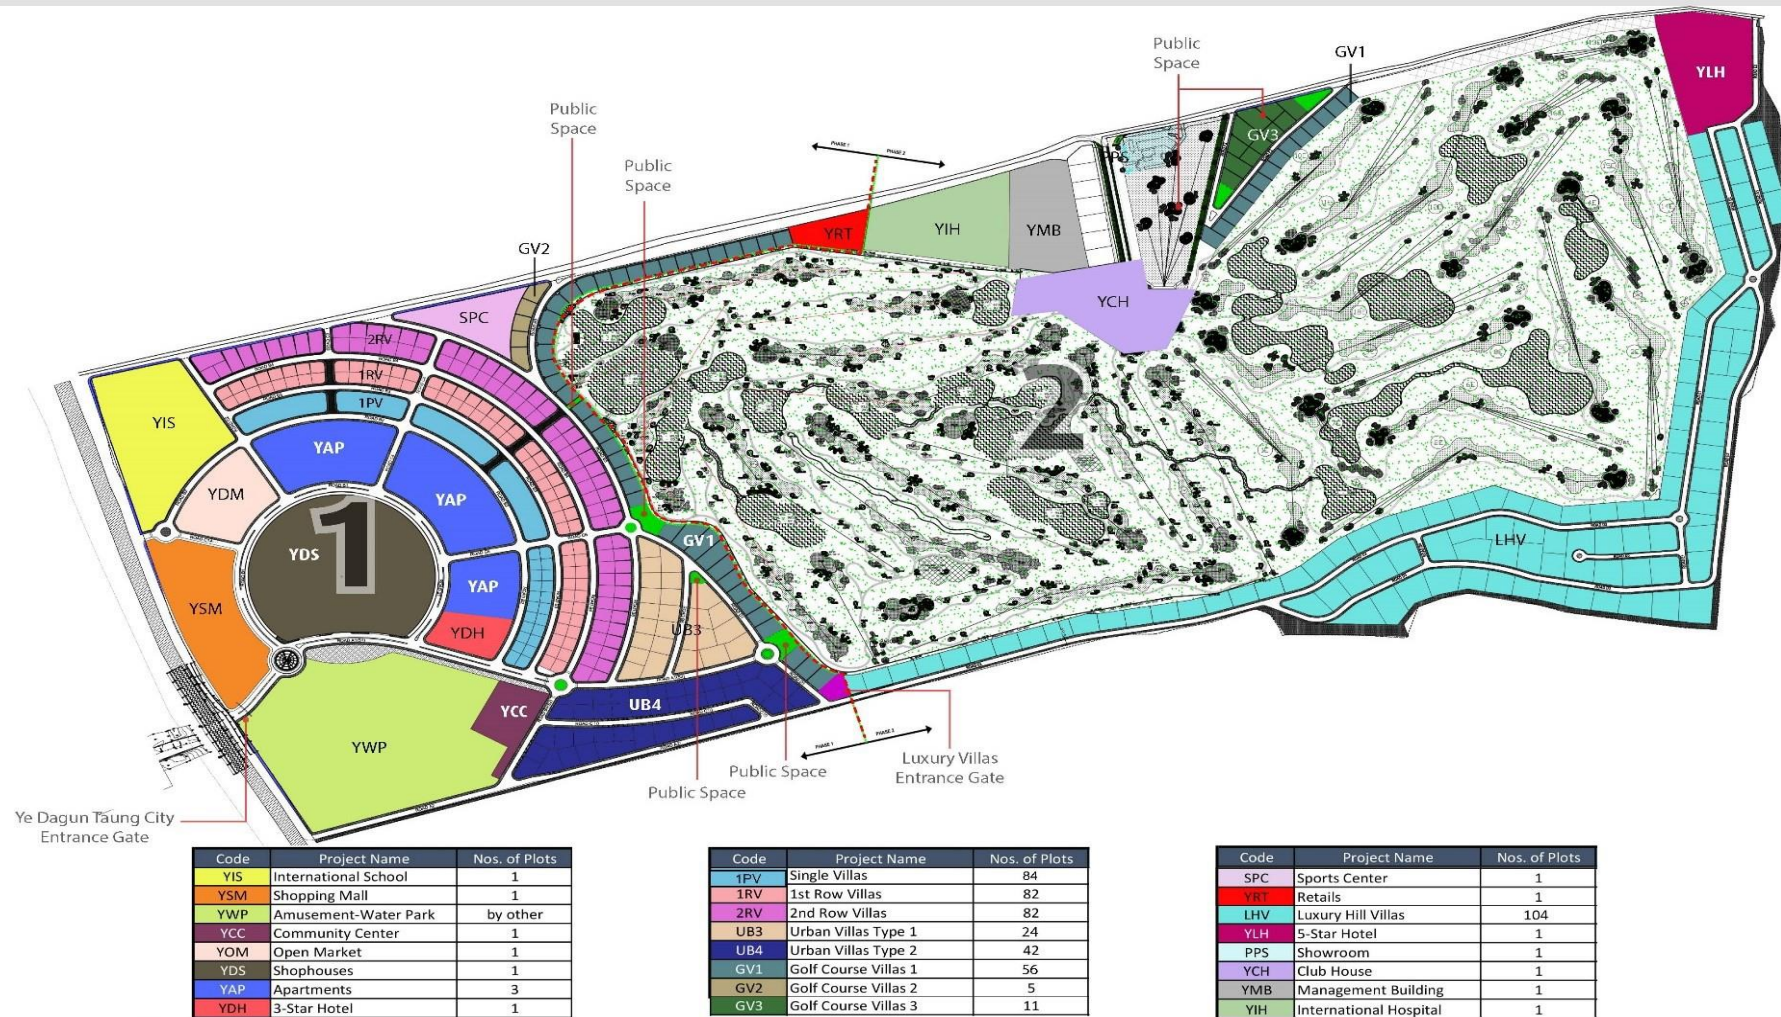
Plot Division of the Yaytagon Hill Master Plan Project
